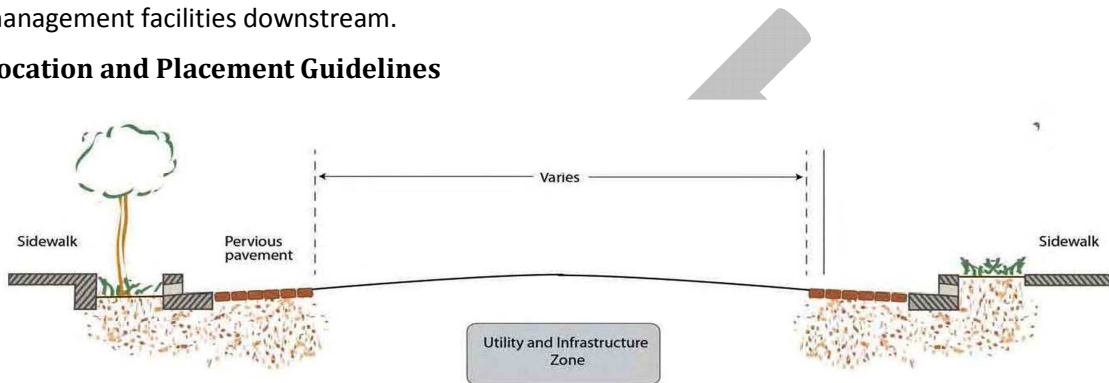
Possible pervious pavement design layout (*Model for Living Streets Design Manual, 2011*).
